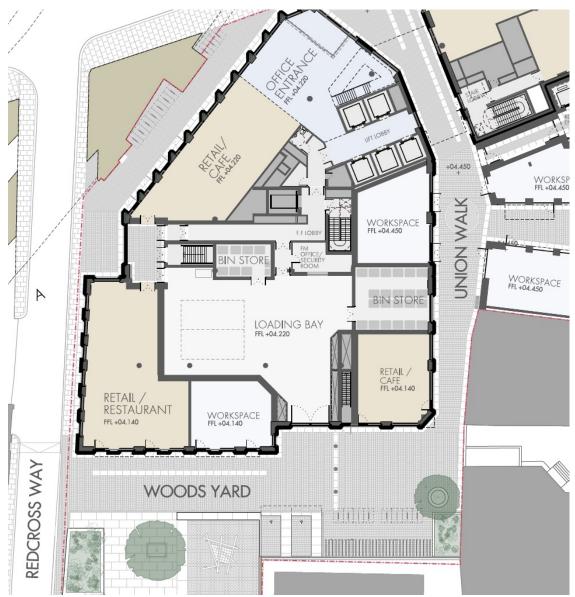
Ground floor layout showing the internal loading bay. To access the bay, vehicles would travel southbound along Redcross Way, turn left off the highway into Woods Yard, traverse the space and enter the loading bay via the double doors.
